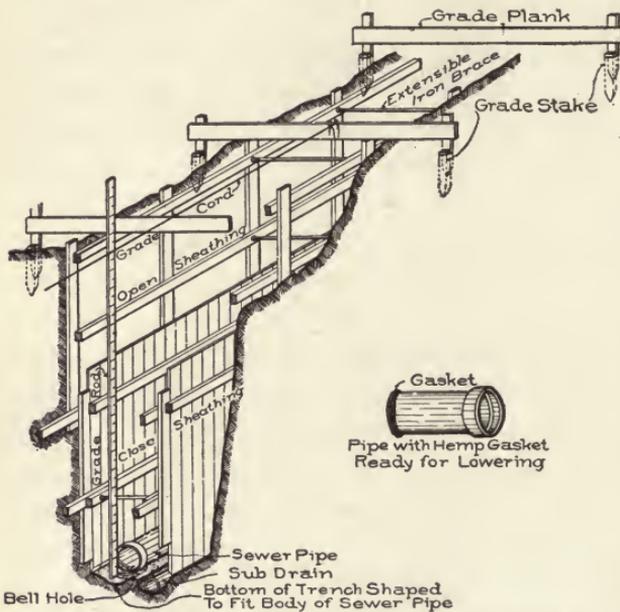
Diagram Showing Construction of Pipe Sewer.
